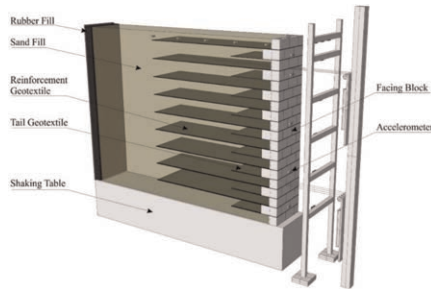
Schematic of geosynthetic reinforced soil retaining wall model.
